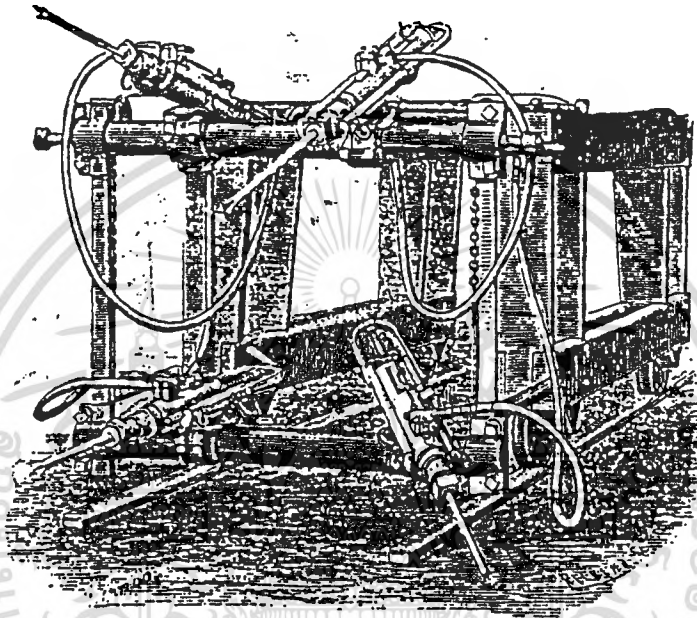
Burleigh drills on a main-line jumbo as used on the Hoosac Tunnel in Massachusetts and the Sutro Tunnel in Nevada in the 1870s. (Ingersoll-Rand Co.)
